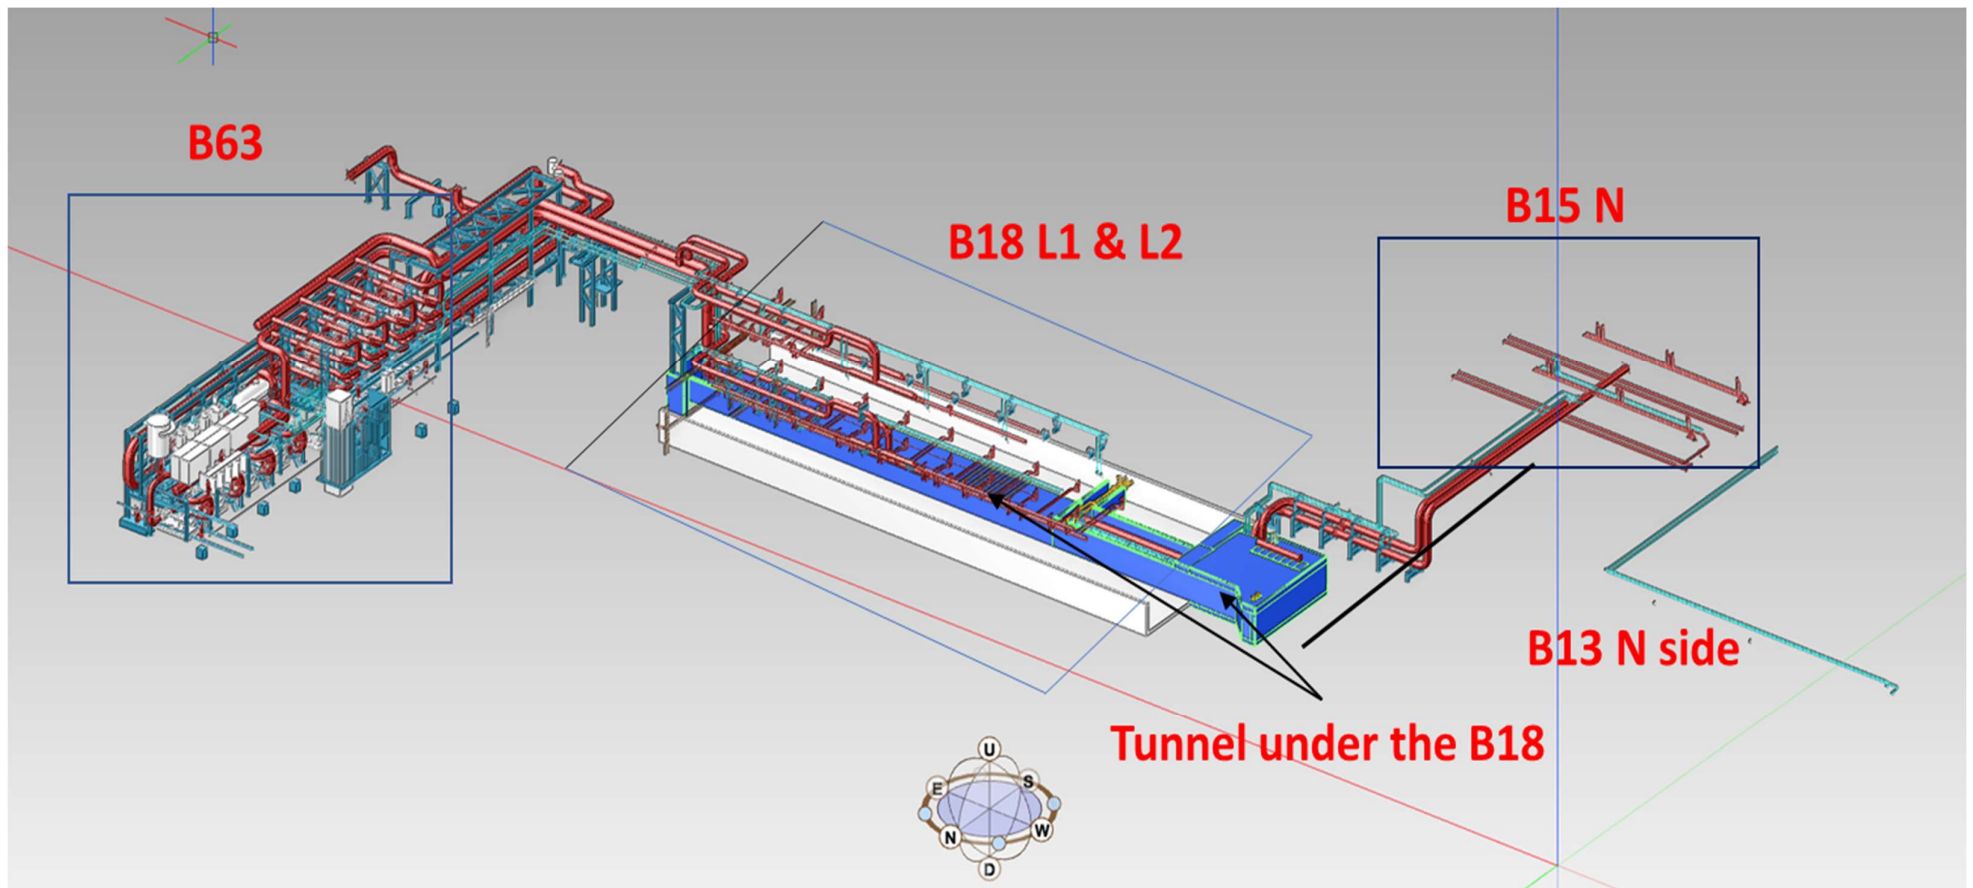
Overall Piping Network of CCWS-2F and CHWS-H4
